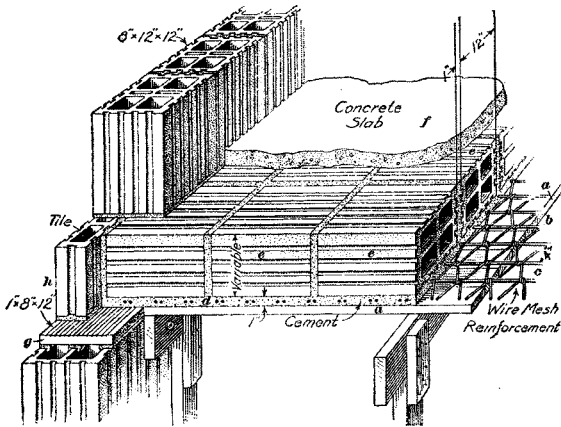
The "Johnson" system of floor construction (from White and Lowndes, *Hollow Tile Construction*, 59).
